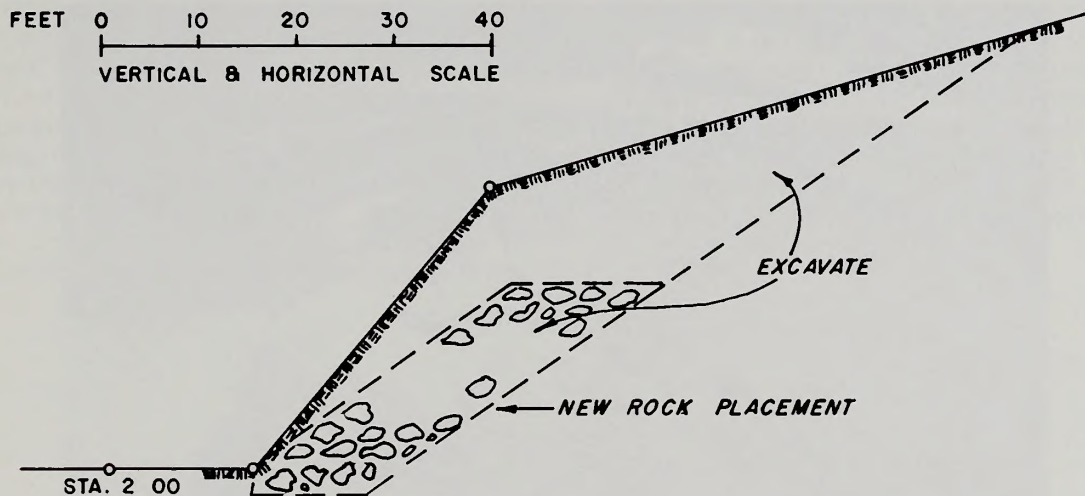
A sample design for a rock buttress to provide support for a failing slope. Note the toe of the buttress is below the subgrade to provide the best support for the buttress.
